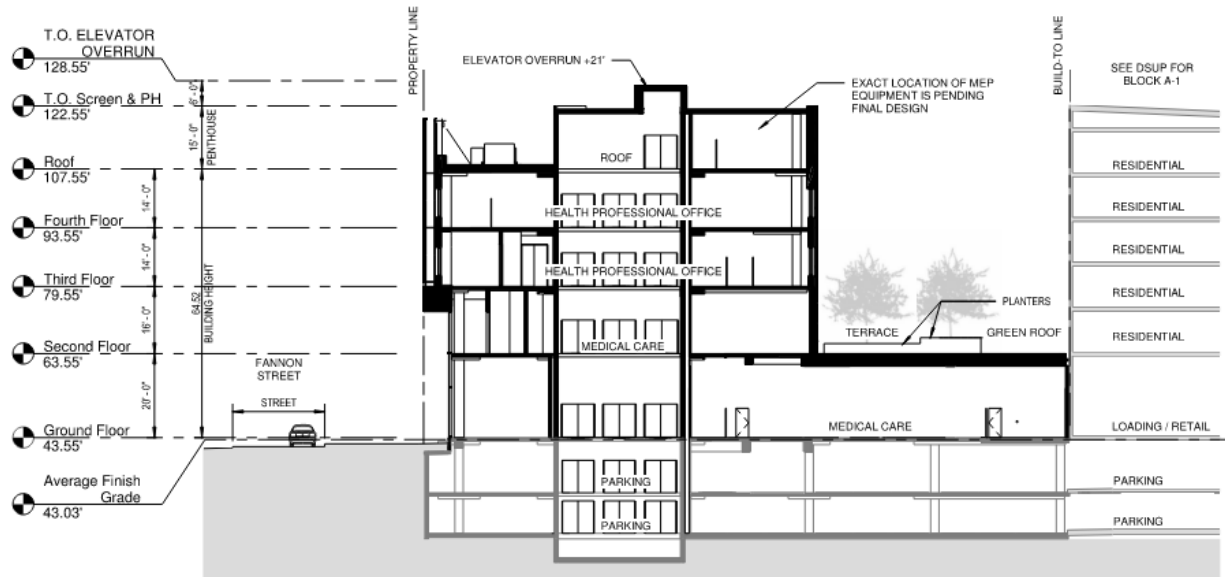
Building section of the proposed Healthplex, on left, and connection to adjacent multi-family building, on right. (As seen from Richmond Highway)
